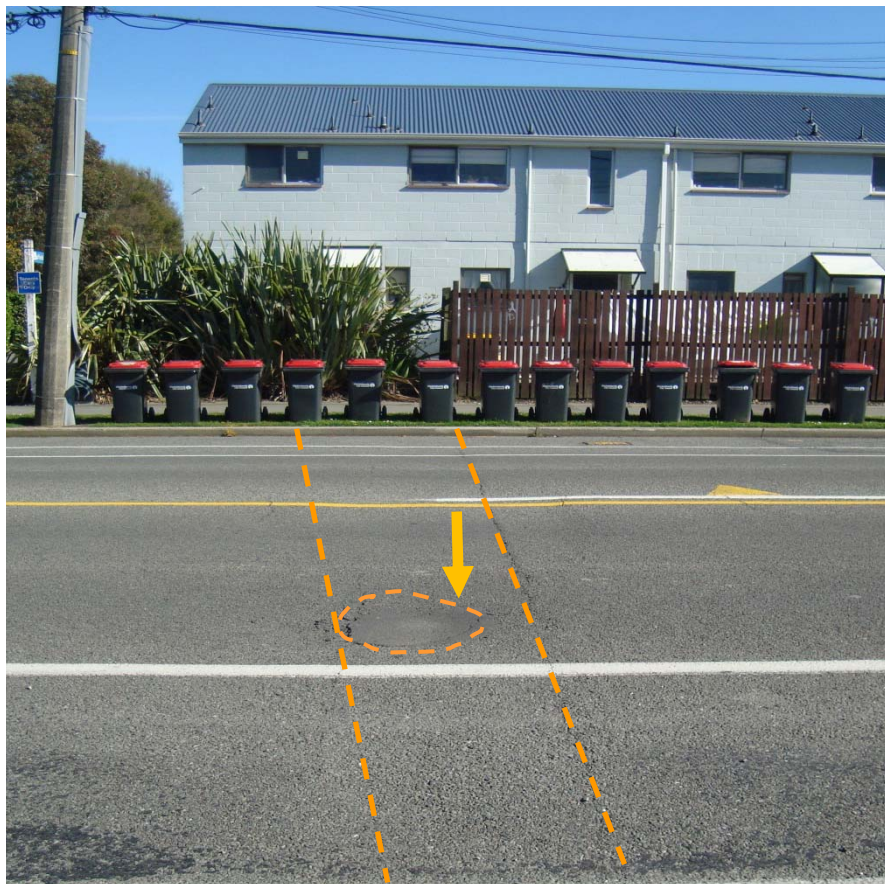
Up to 10mm wide cracks on the asphalted footpath across the street from Hadfield Courts and up to 20mm of ground heave
